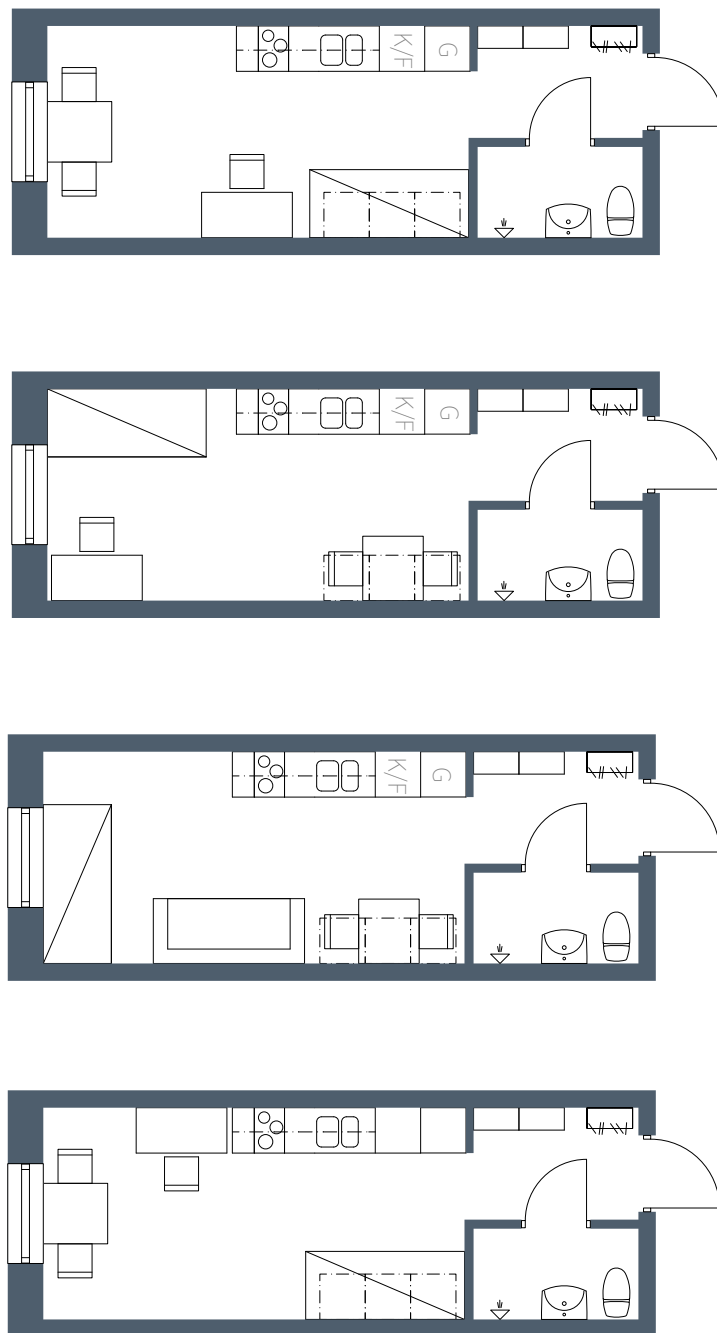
Studio apartment floor plan, alternative furnishing.
